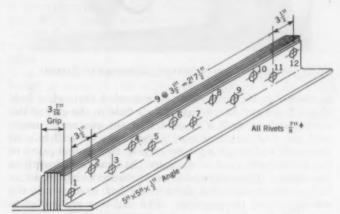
SPECIMEN USED IN RIVET TENSION TESTS
